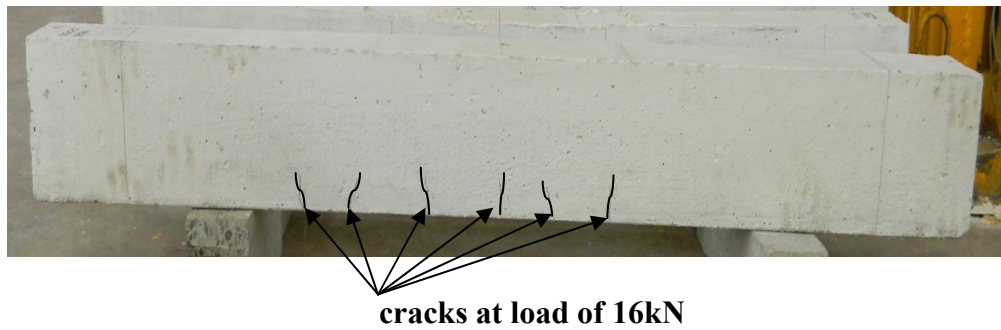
Cracking in one of the RC beams loaded to 30% of maximum load
